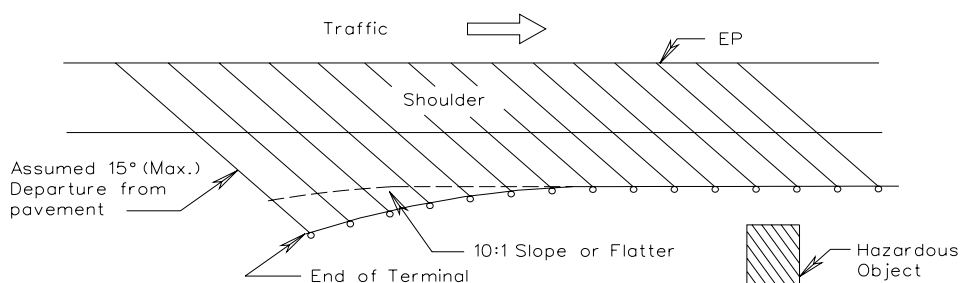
M - SUGGESTED SLOPES FOR APPROACH BARRIERS
